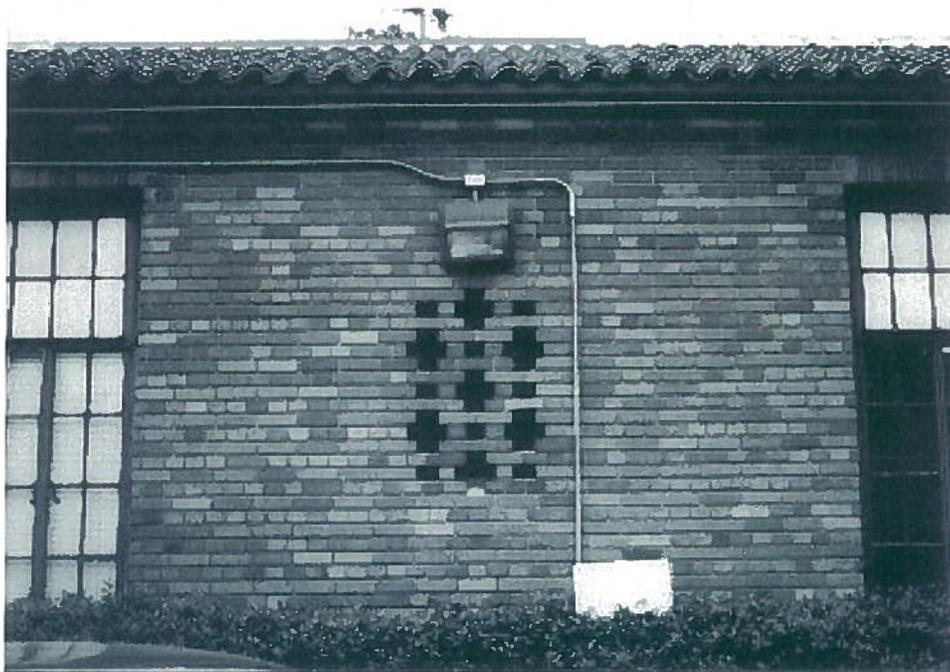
Detail of ornamental brickwork in the east classroom wing, looking west. October 26, 2005.
